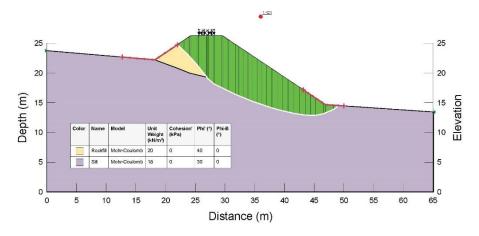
Slope stability of rockfill embankment over silt on sloping ground surface. Min FOS= 1.4
